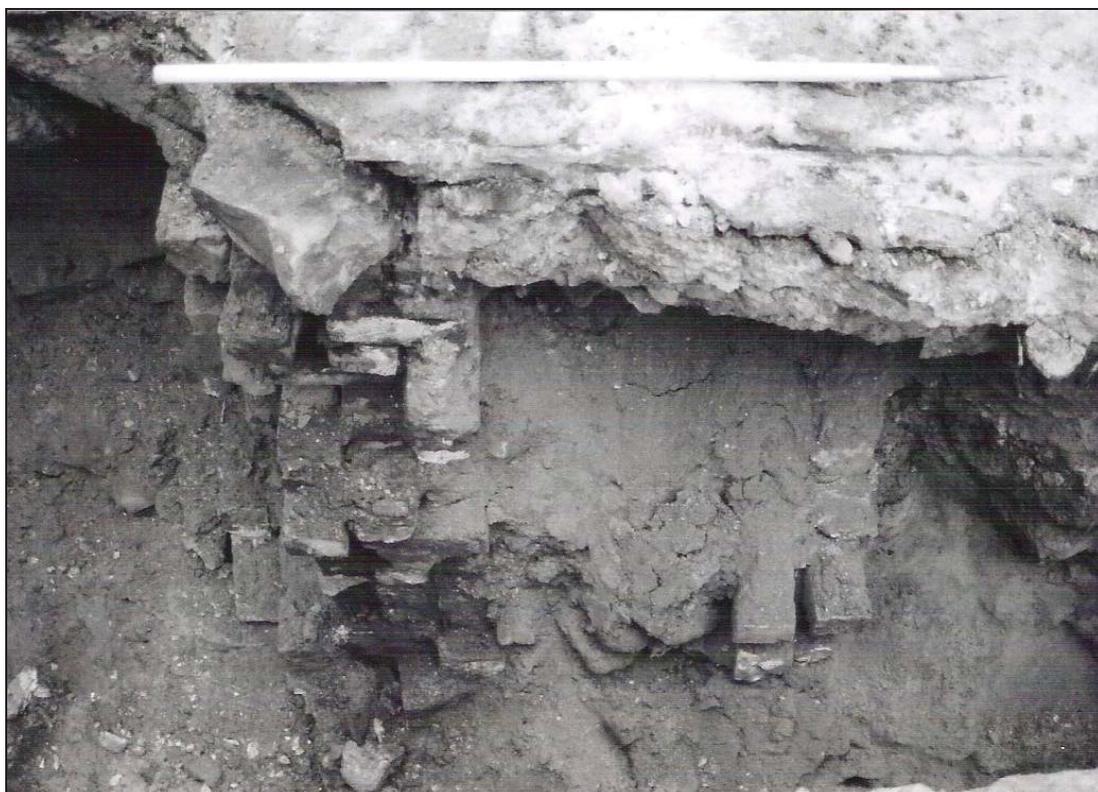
South facing section: junction of drain trench and inspection pit
